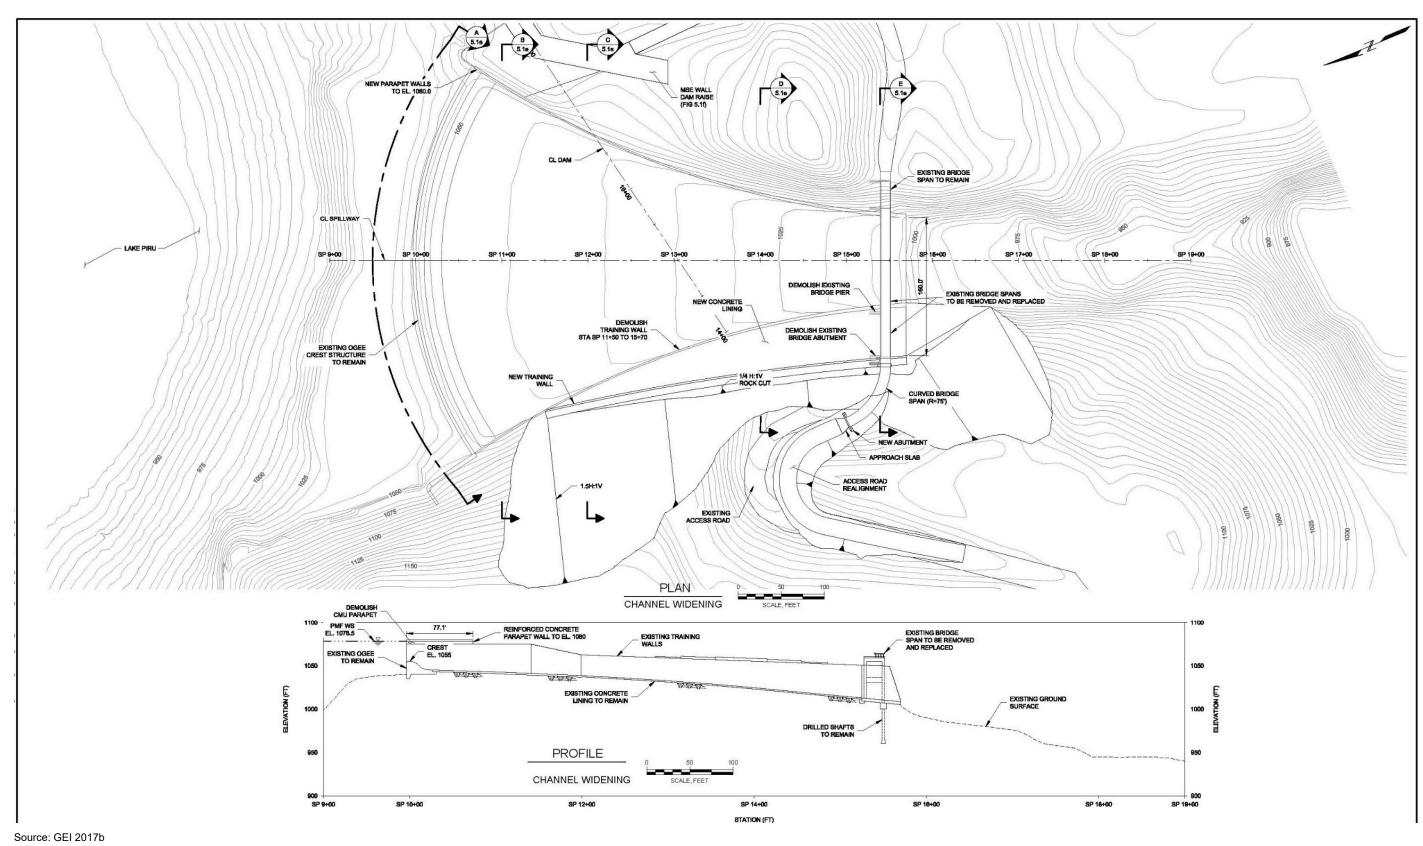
Plan and Profile View of the Spillway Channel Widening Option
